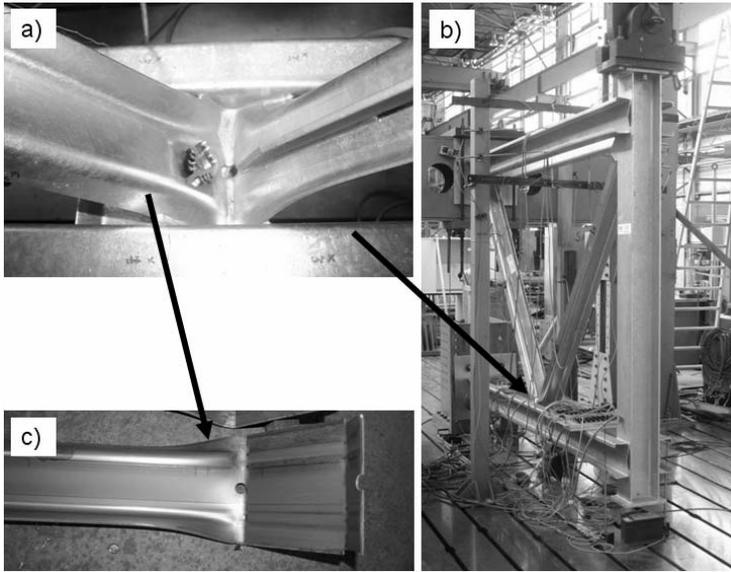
Welded truss joint (a), truss (b), and end of bar (c)
